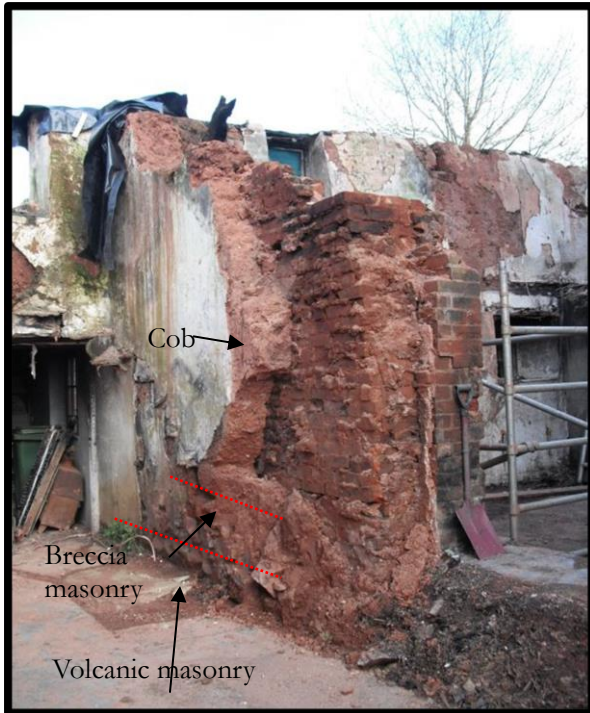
View of the party wall between the houses, looking east, showing the brick chimneystack cutting the cob wall, and rubble masonry in the lower part of the wall below this.
